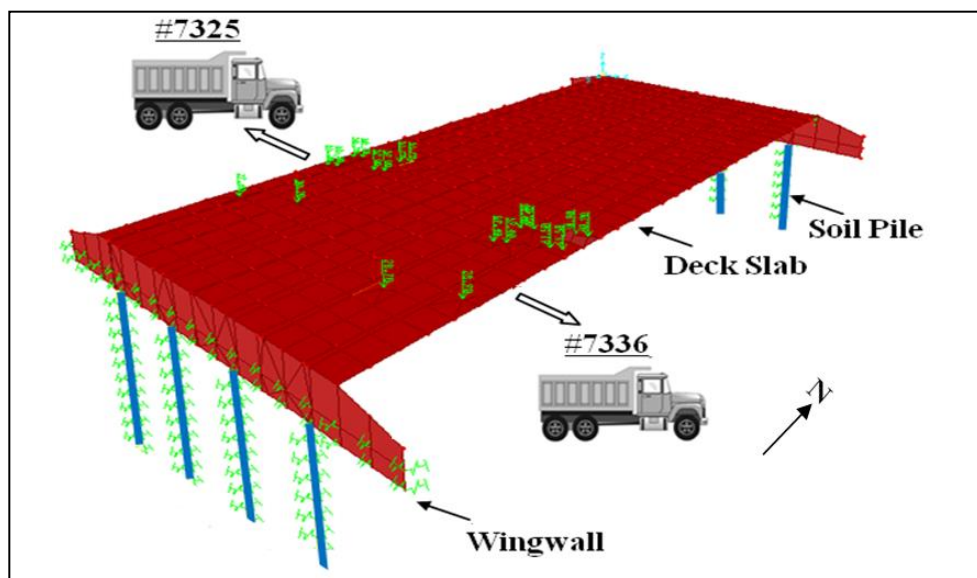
3D Truck loading for bridge at load case #13 in FEA.
